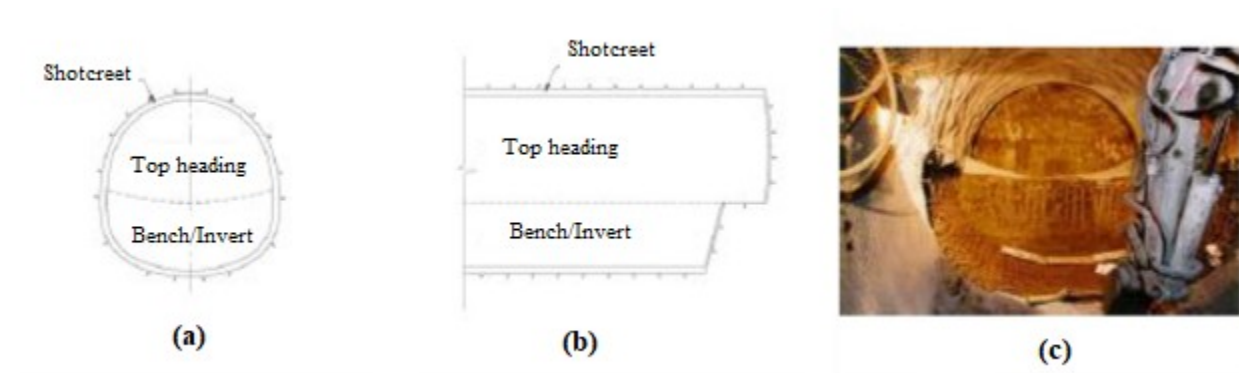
8: London bridge station, London, UK, (a) cross section, (b) longitudinal section and (c) photo
